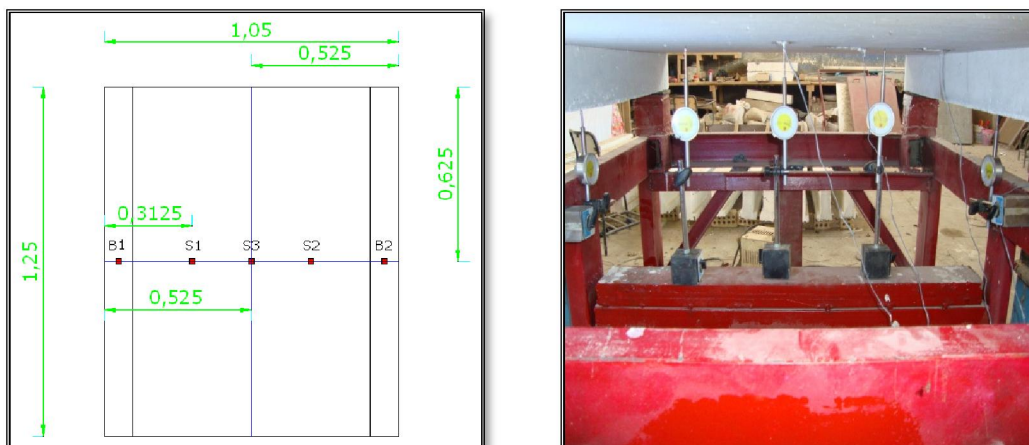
Locations of Dial Gauges in Short Direction of One Way Slab
